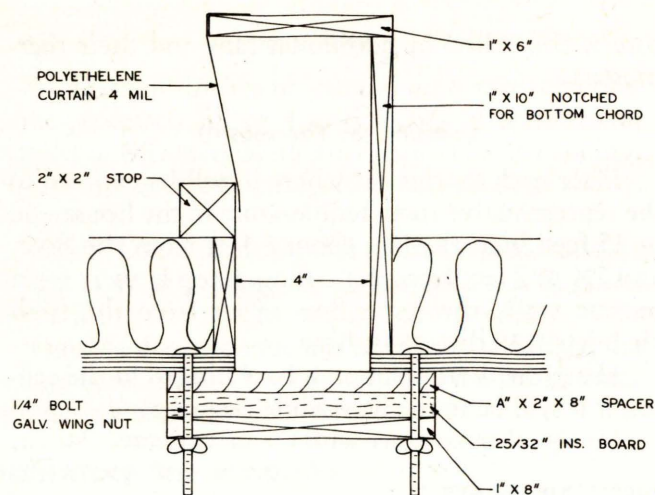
Alternate construction details of the slot inlet through ceiling with baffle, spacer and curtain.
